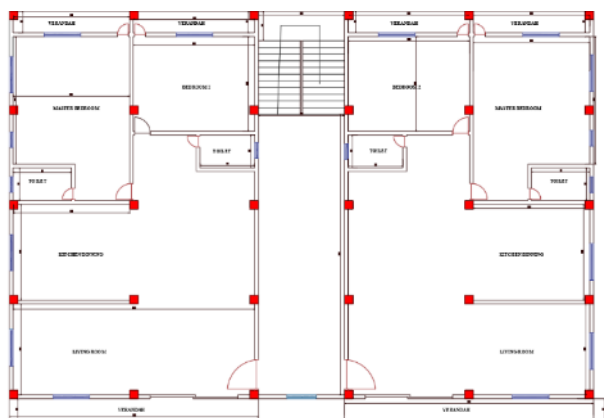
Architectural Floor Plan Fig. 4 Column Layout
